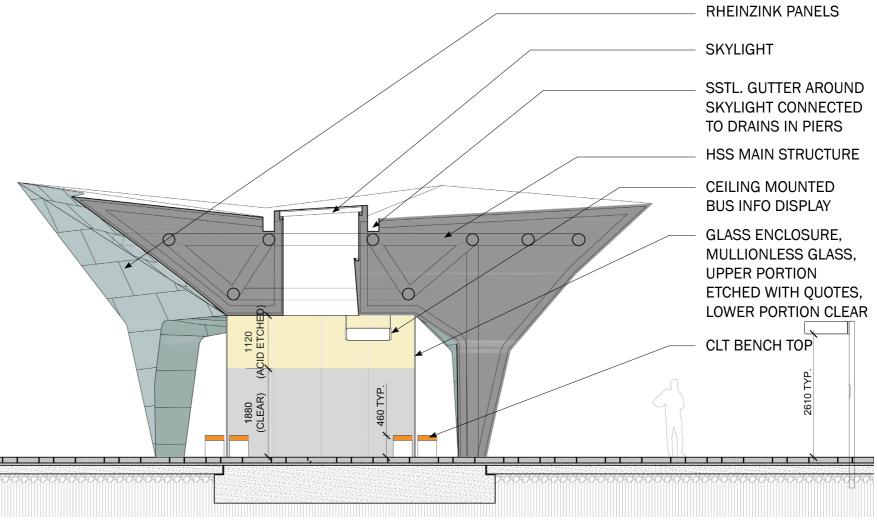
Diagram Section, SCALE=1/80
